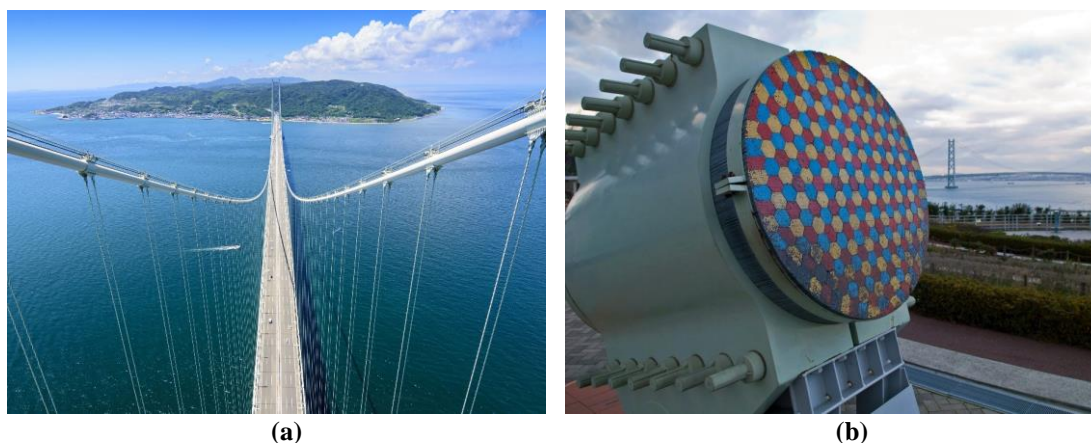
(a) Top view of the world's longest suspension bridge, the Akashi-Kaikyō Bridge in Japan [5]; and (b) in detail, a steel cable section containing strands of high-tensile wires made from pearlitic steels [6]
